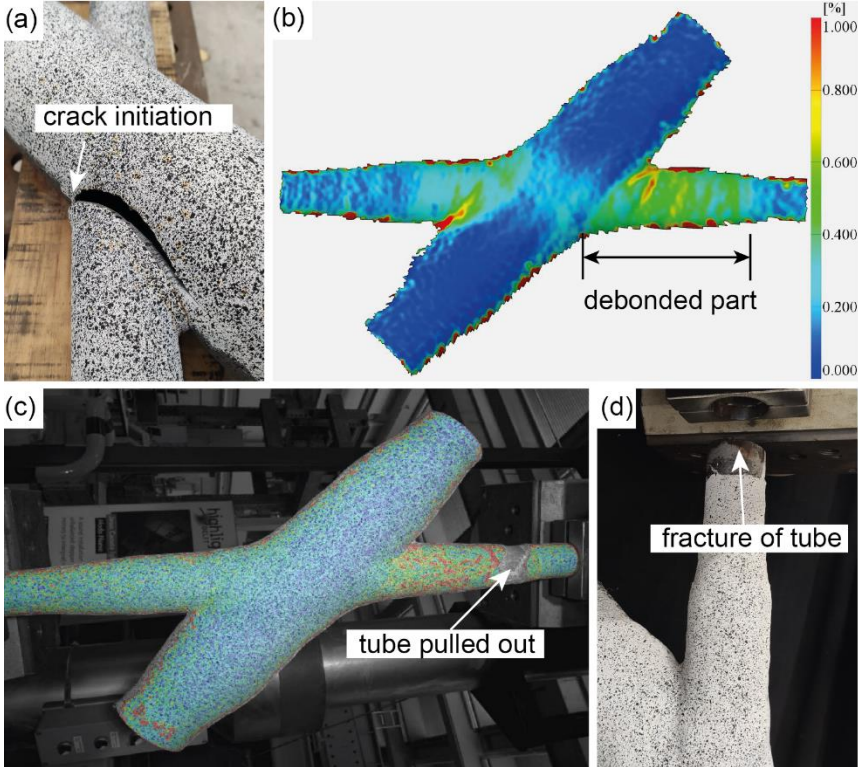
Other failure modes (a) fracture of welded joints; (b) debonding of wrapped composite joint indicated by strain increase on the surface; (c) debonding during the fatigue test (cX45-Ss-T_F3.3); (d) fracture of steel tube of wrapped composite joint cX45-Ss-T_F2.1b
